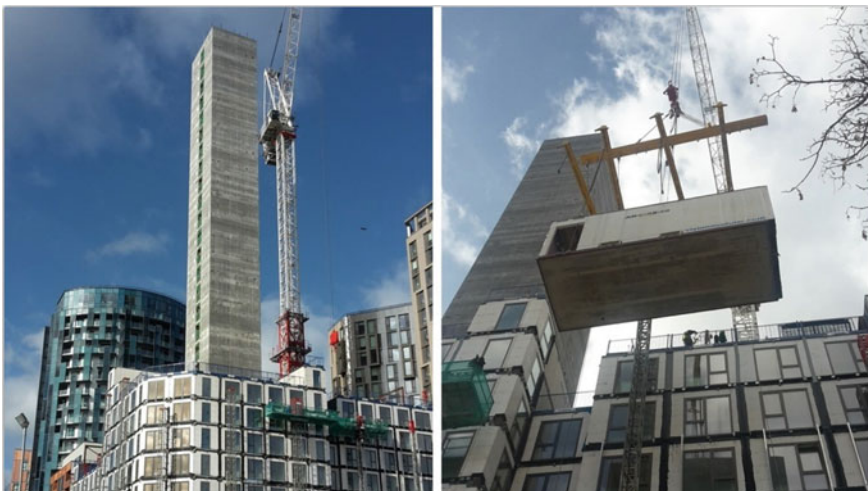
Modular construction with concrete core. (Source Apex Modular)
